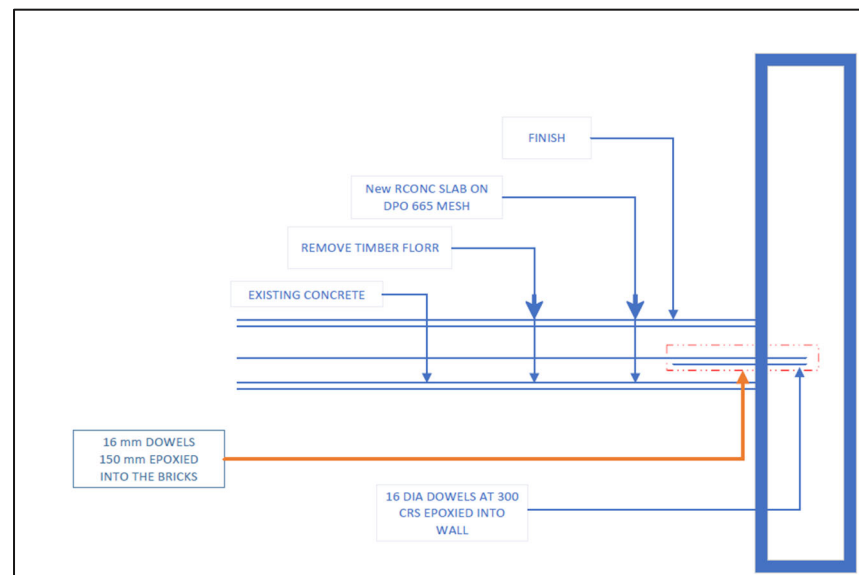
The original timber ground floor has been changed to a 100 mm concrete slab on grade reinforced with 665 mesh. Fill with a minimum depth of 100 mm has been provided below the slab. The slab is connected to the URM walls with D16 dowels [50].
